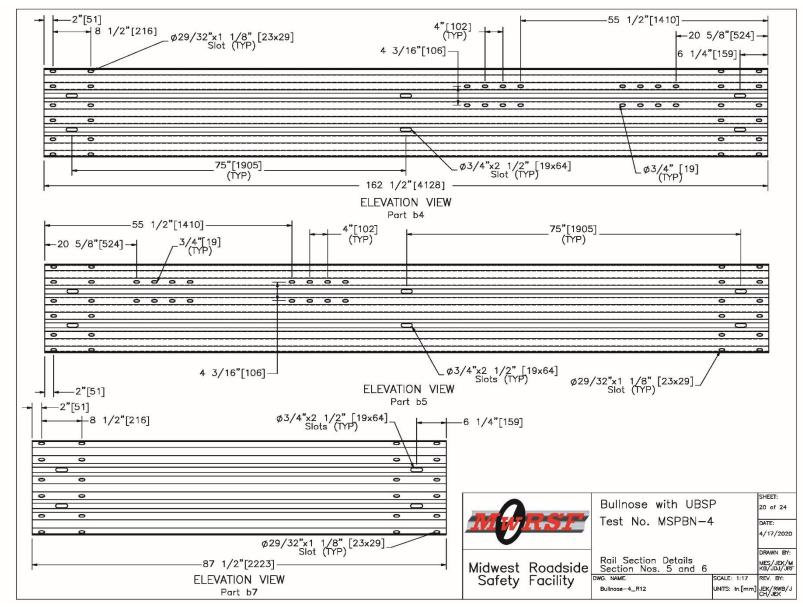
Rail Section Details Section Nos. 5 and 6, Test No. MSPBN-4
